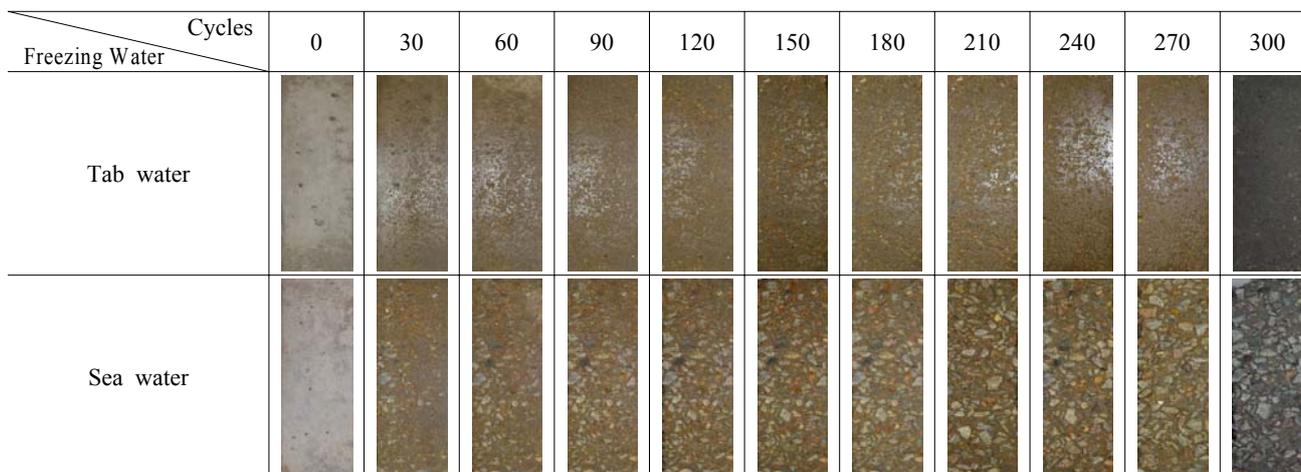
Surface scaling with freezing water (W/B 42% OPC Concrete)
